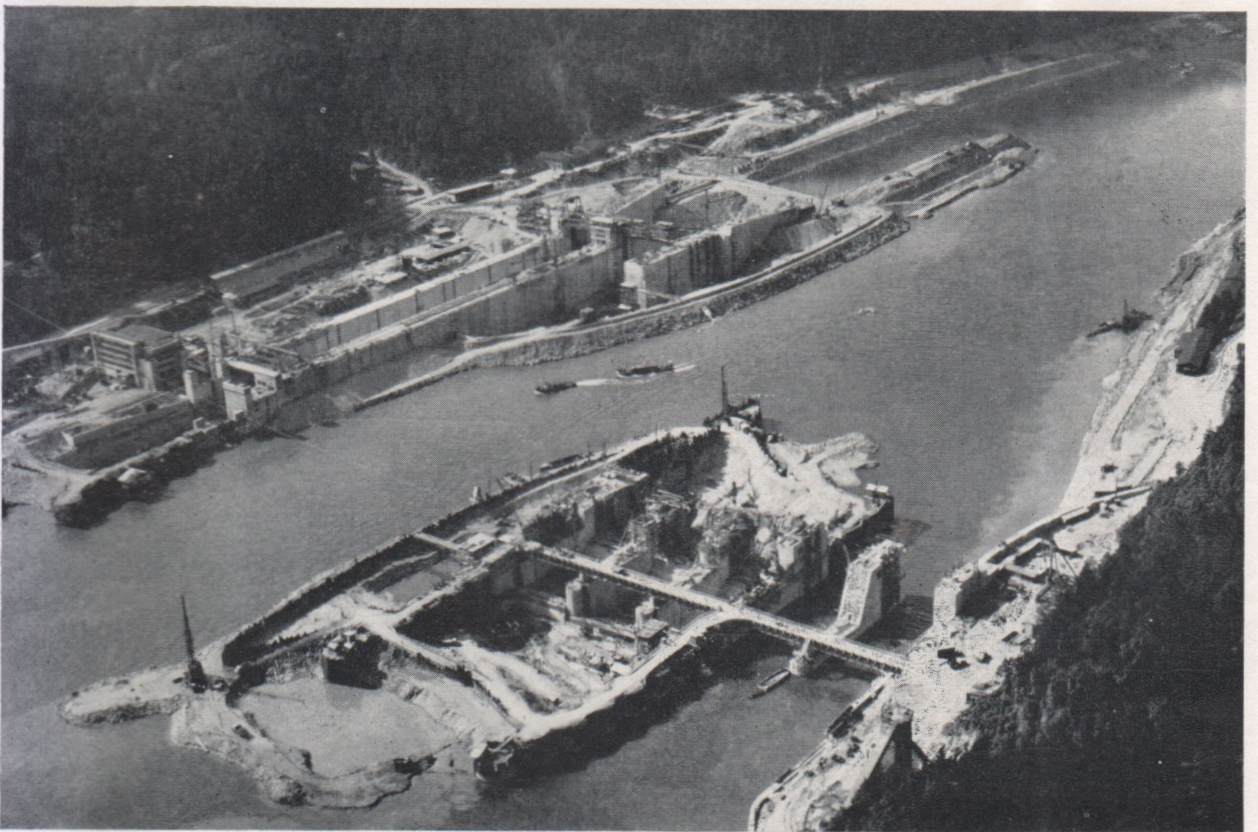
Construction Section IB, looking upstream, on 13 September 1961. Completed spillway openings 1 and 2 can be seen on the right, and the island construction pit for openings 3 to 5 is in the centre
